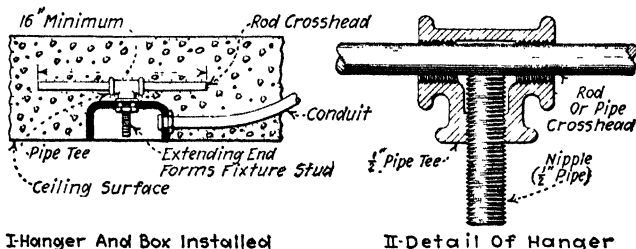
An improvised conduit-box hanger to be used where a heavy fixture is to be supported.
